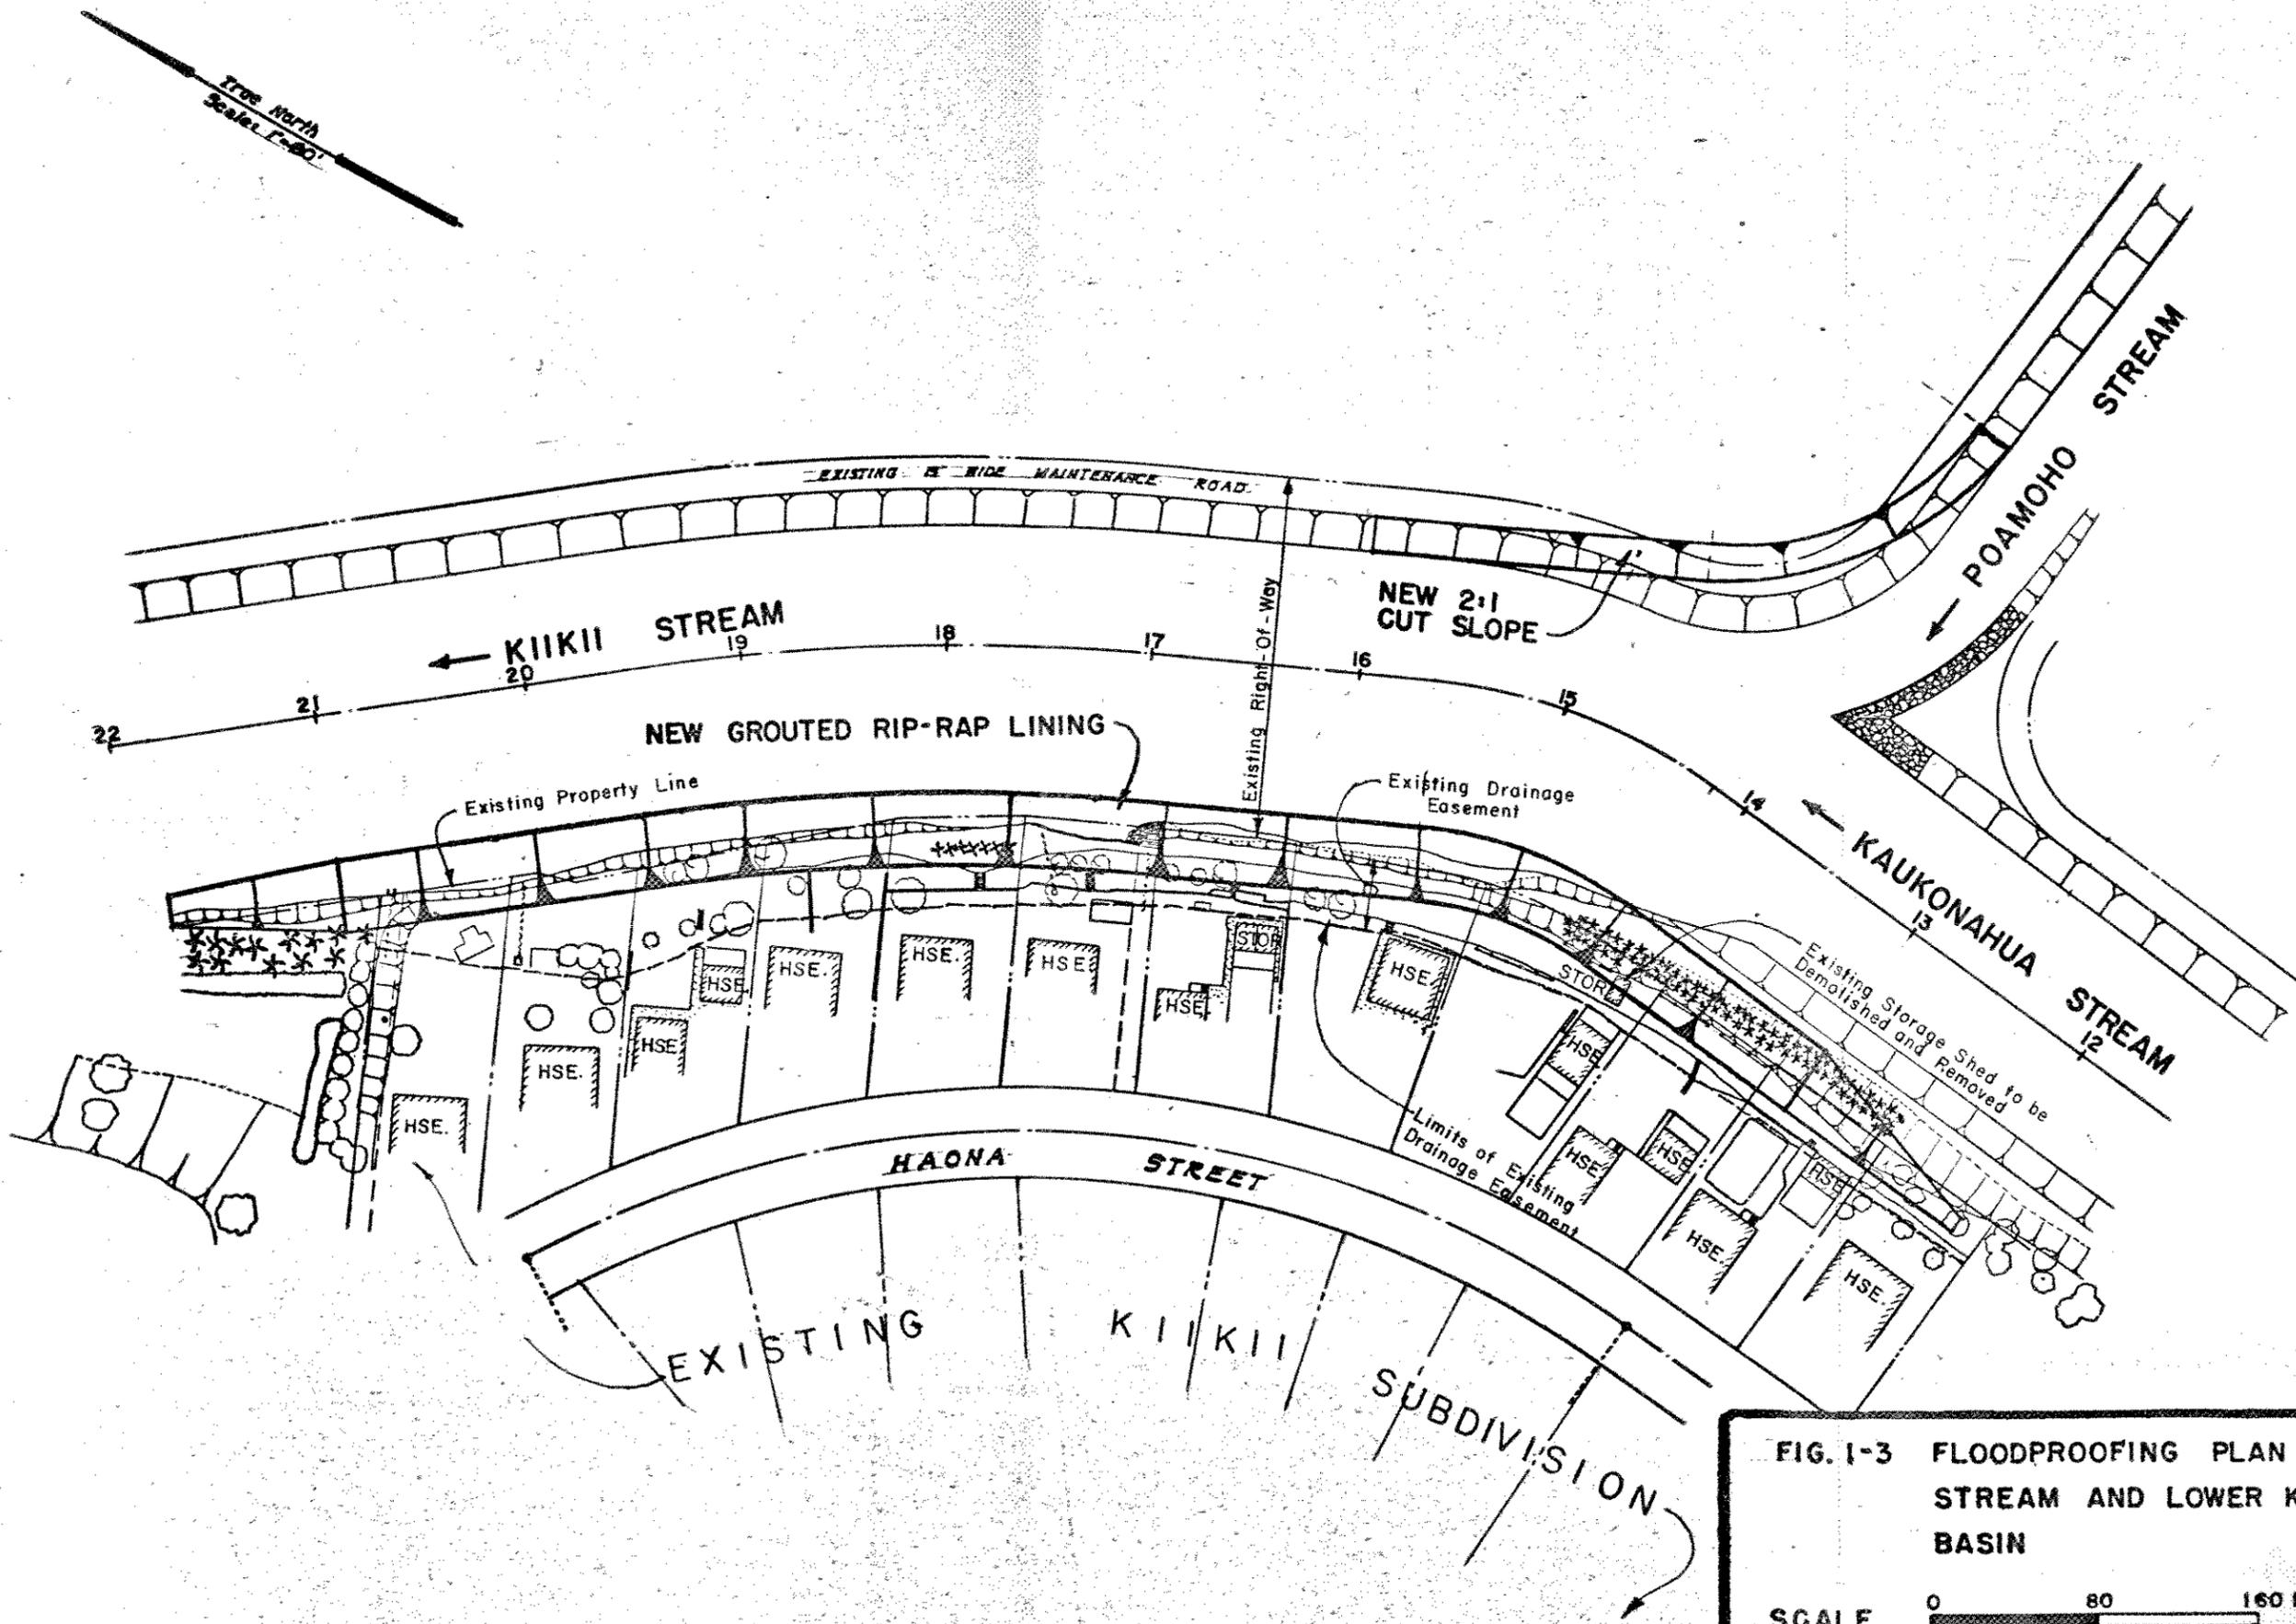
FLOODPROOFING PLAN FOR UPPER KIIKII STREAM AND LOWER KAUKONAHUA BASIN
